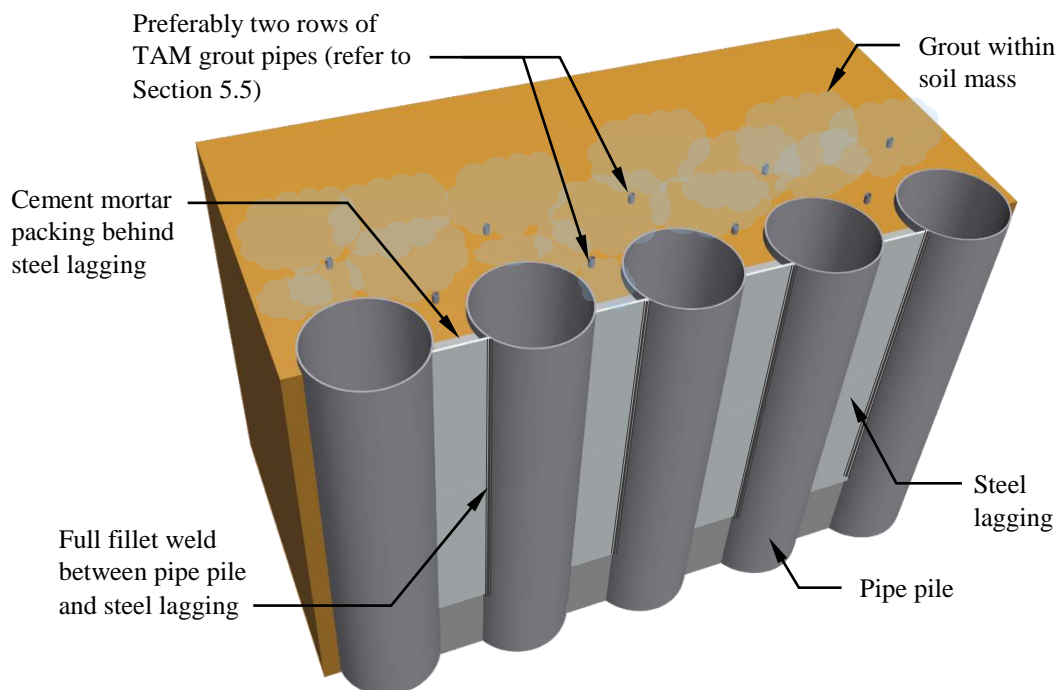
Typical Pipe Pile Wall with Grout Curtain
